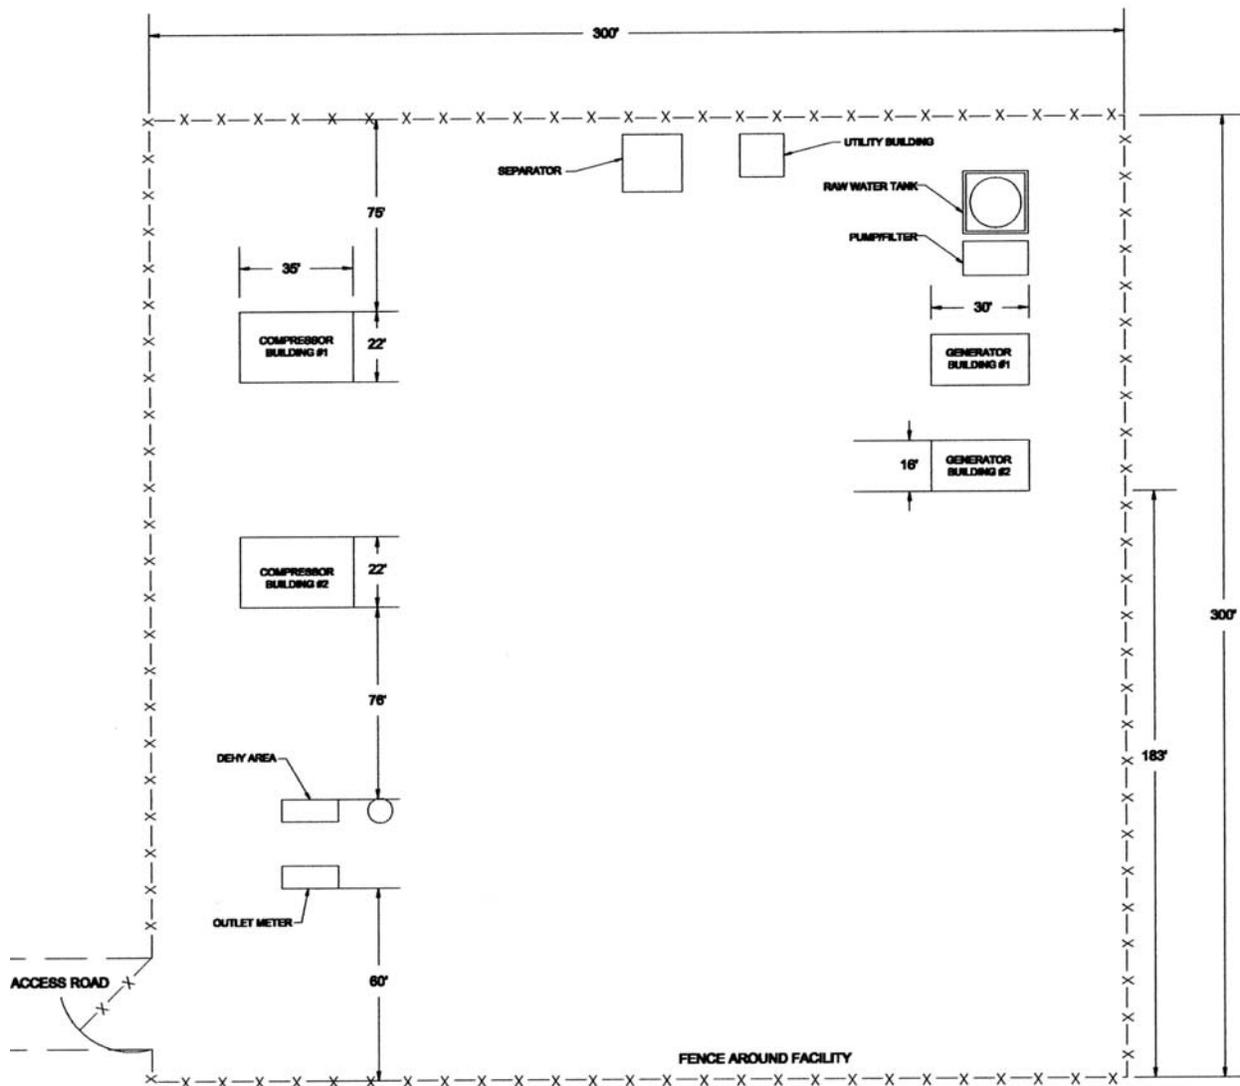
Typical Compression Facility – Atlantic Rim Natural Gas Project.
